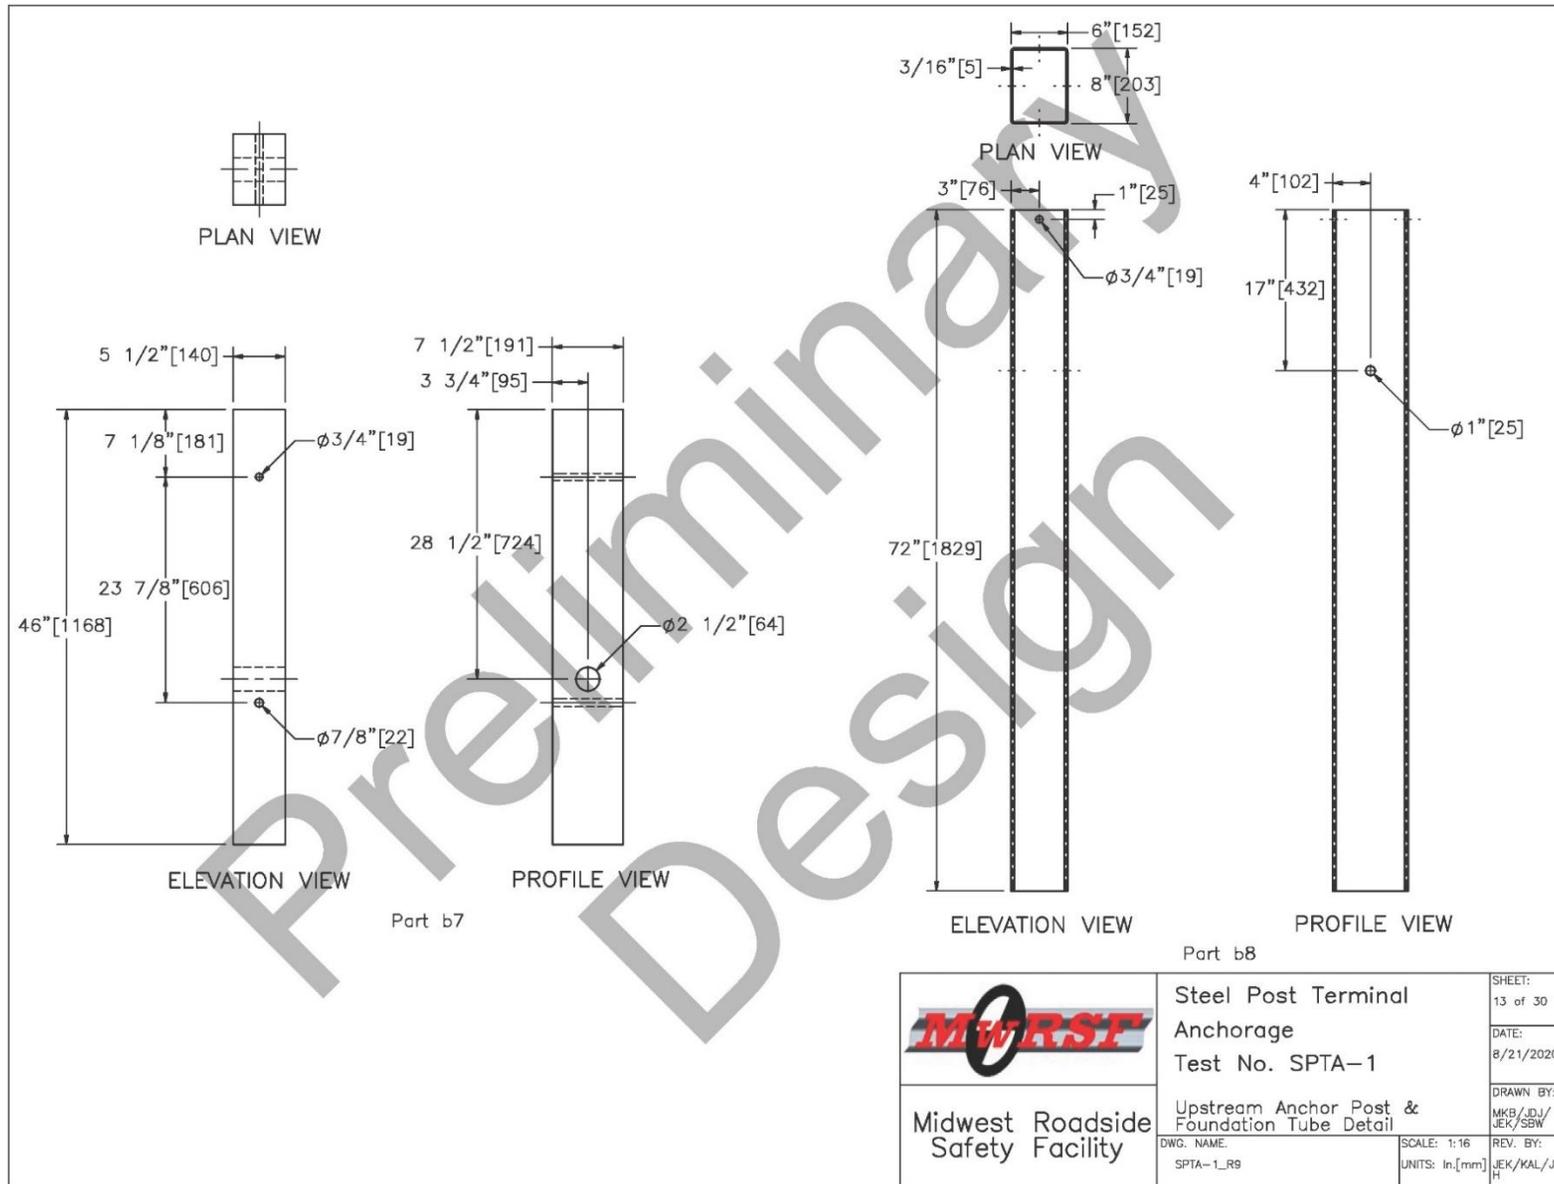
Upstream Anchor Post and Foundation Tube Detail, Test No. SPTA-1
